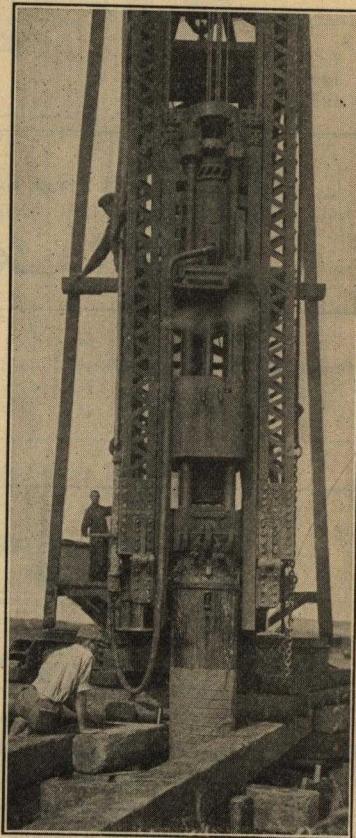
Steam hammer showing detail of hinged leads, ram, and driving cushion, Raymond Concrete Pile Co.
